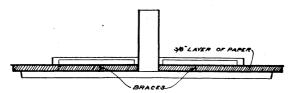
Section through galvanized-iron cover, showing paper insulation.
